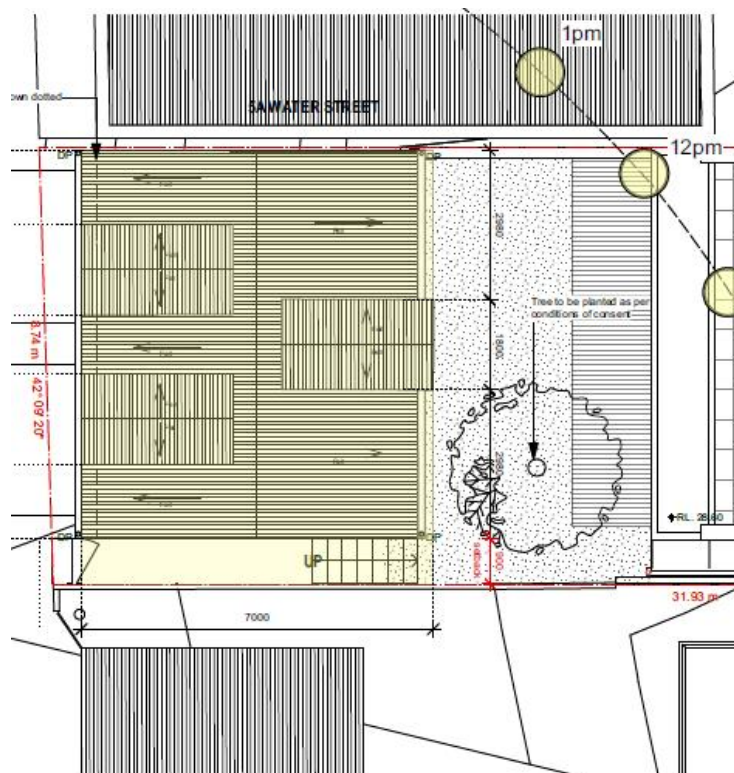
Site Plan showing the BLZ established by the adjoining buildings at No. 10 Reuss Street and No. 5A Water Street, as well as the relationship of the proposed garage/ studio development on the subject site.
